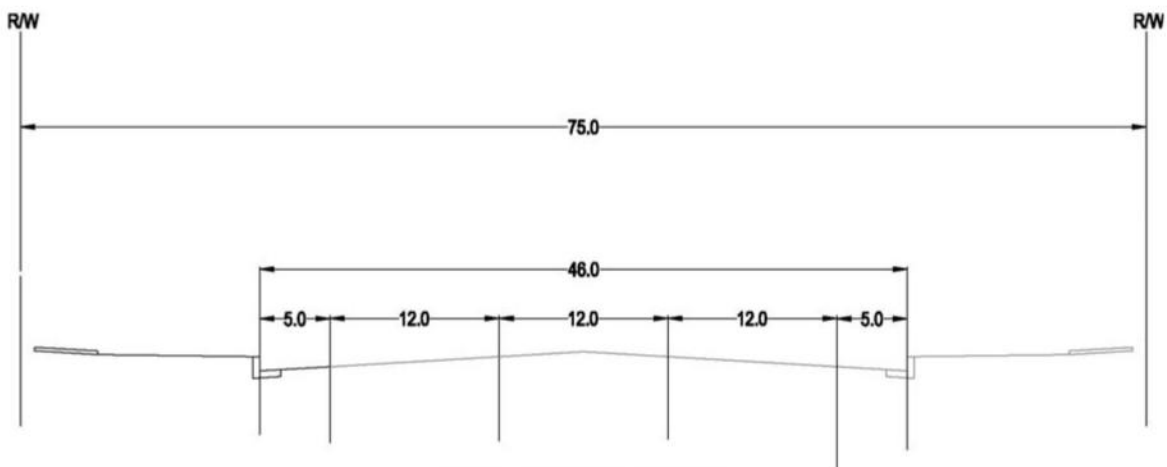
COLUMBIA DRIVE TYPICAL CROSS SECTION
